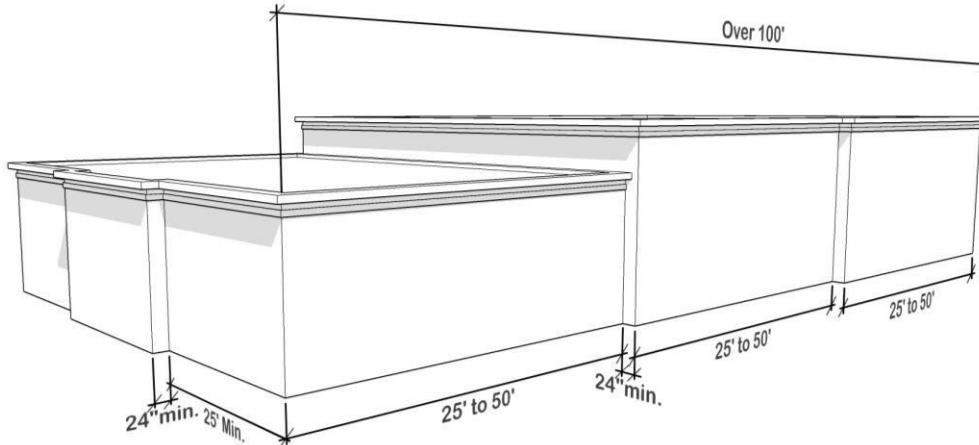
Example of vertical massing breaks using change in wall plane for a building more than 100 feet in length.
